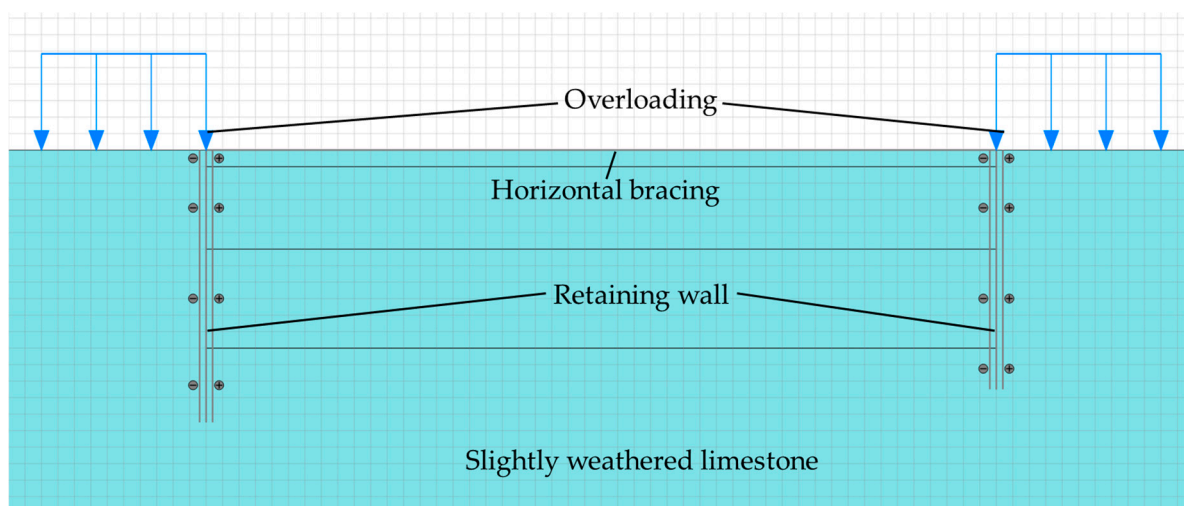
Calculation model of foundation pit supporting structure established by Plaxis.
